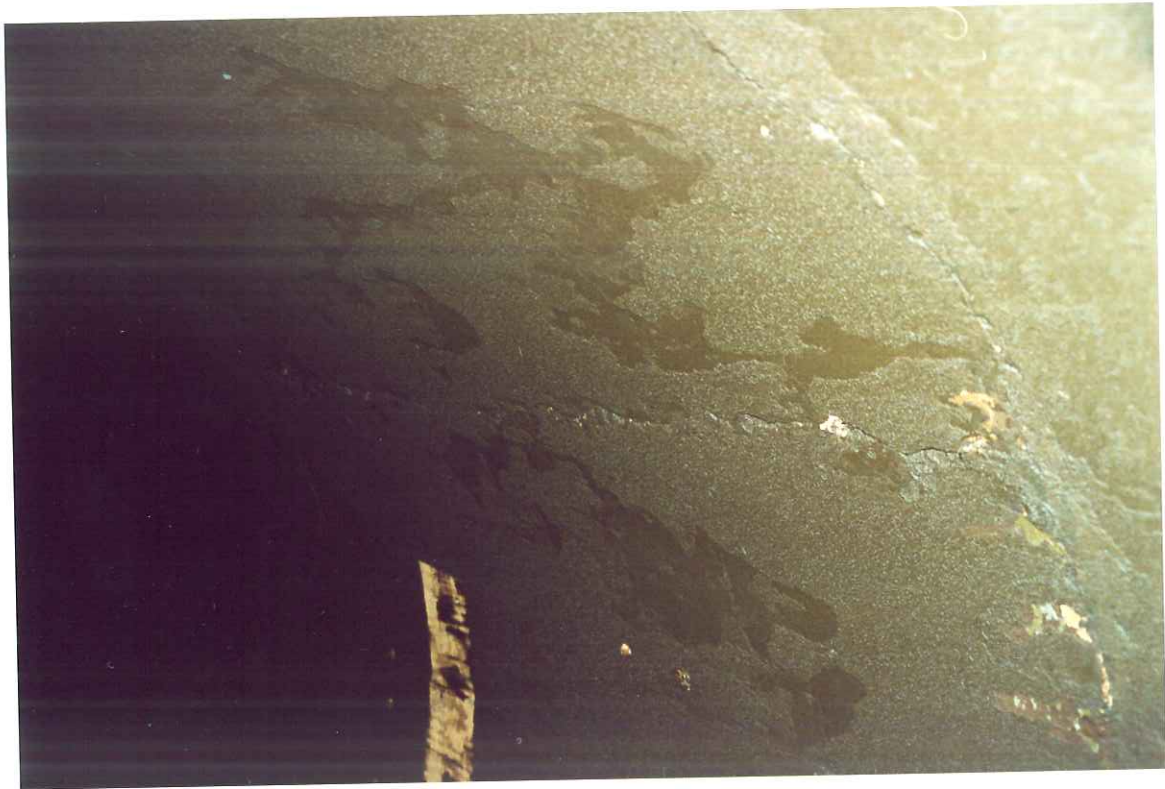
Cracked and hollow lining on the west side of the northern steel short at the failure location 43 to 44 joints south of the entry port at K3+856.
